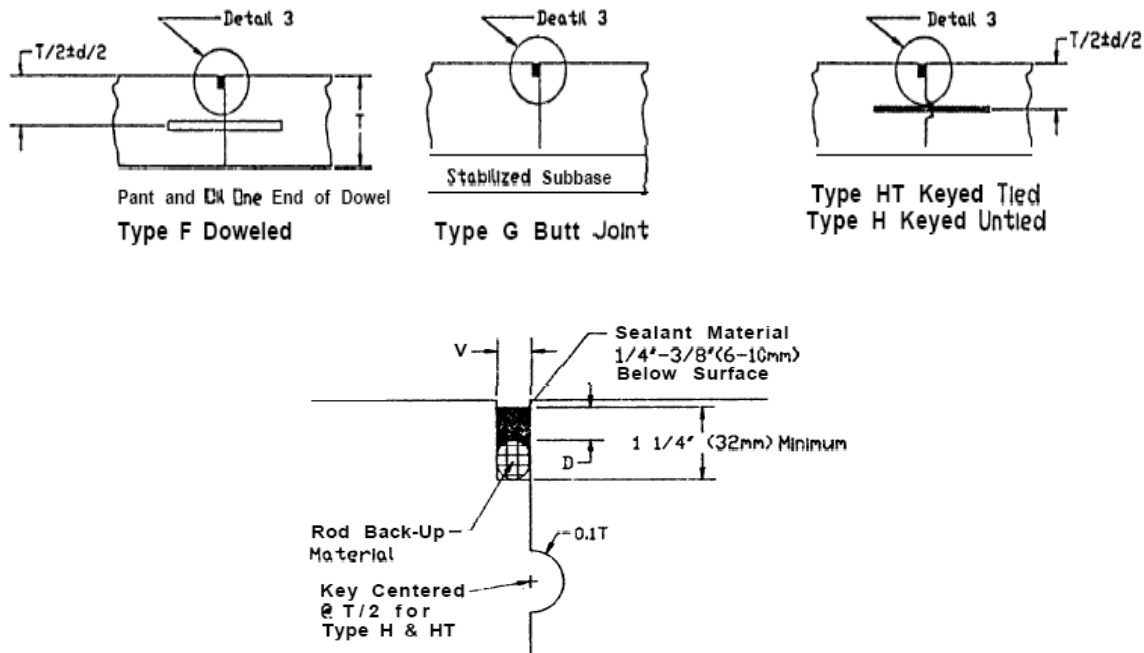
Construction joint details for light load rigid pavement per AC 150/5320-6D.
